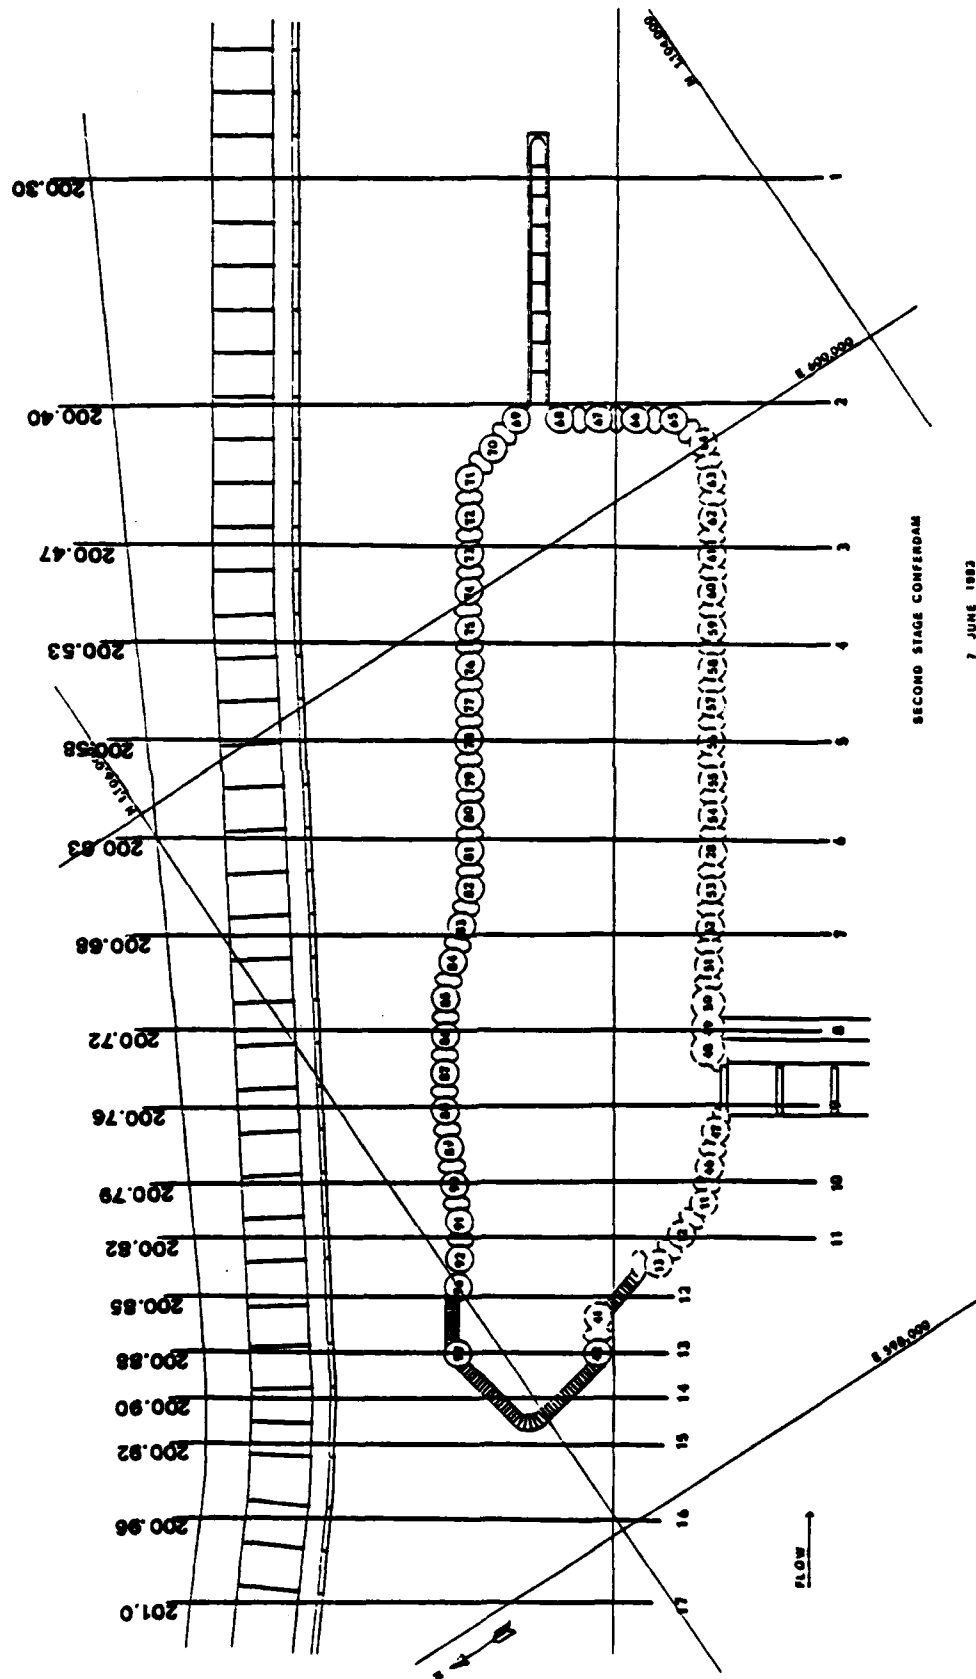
General layout of cross sections used for Stage II Cofferdam.
